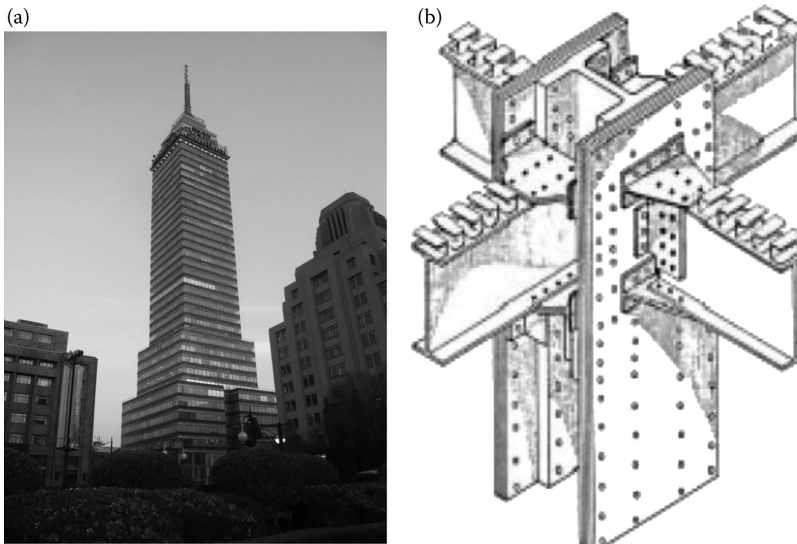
Latino Americana Tower, Mexico City: (a) view of building; (b) structural system.
